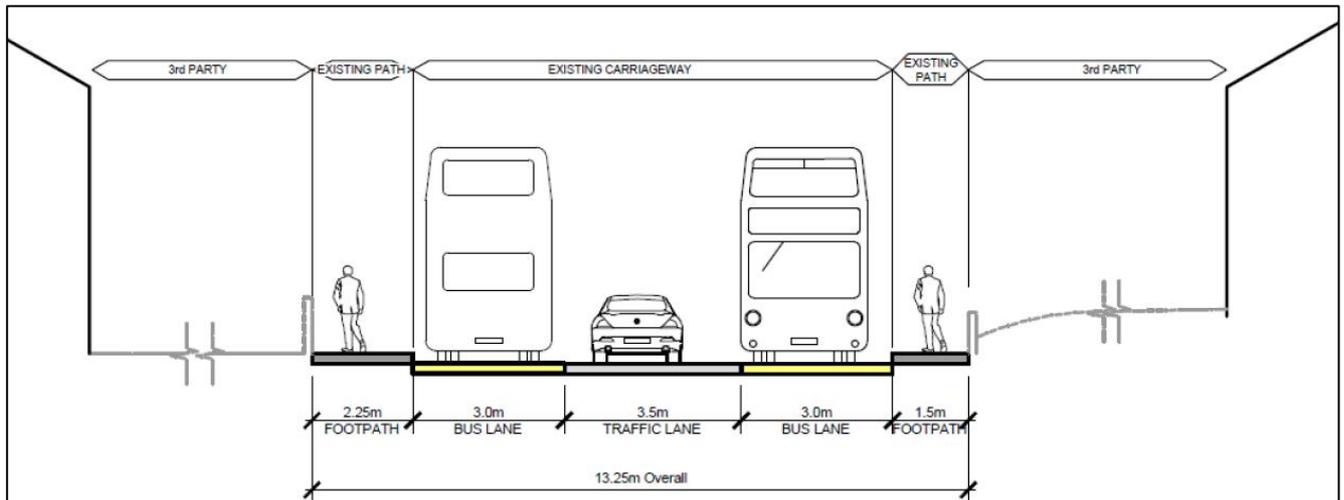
SY1C Cross-Section A-A Swords Road South of Omni Shopping Centre
